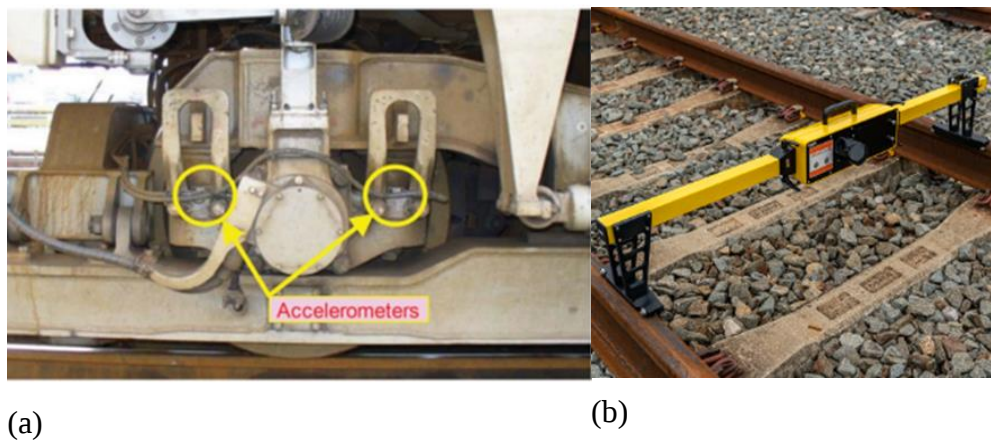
Track geometry trolley and Axle box accelerometer [37]
